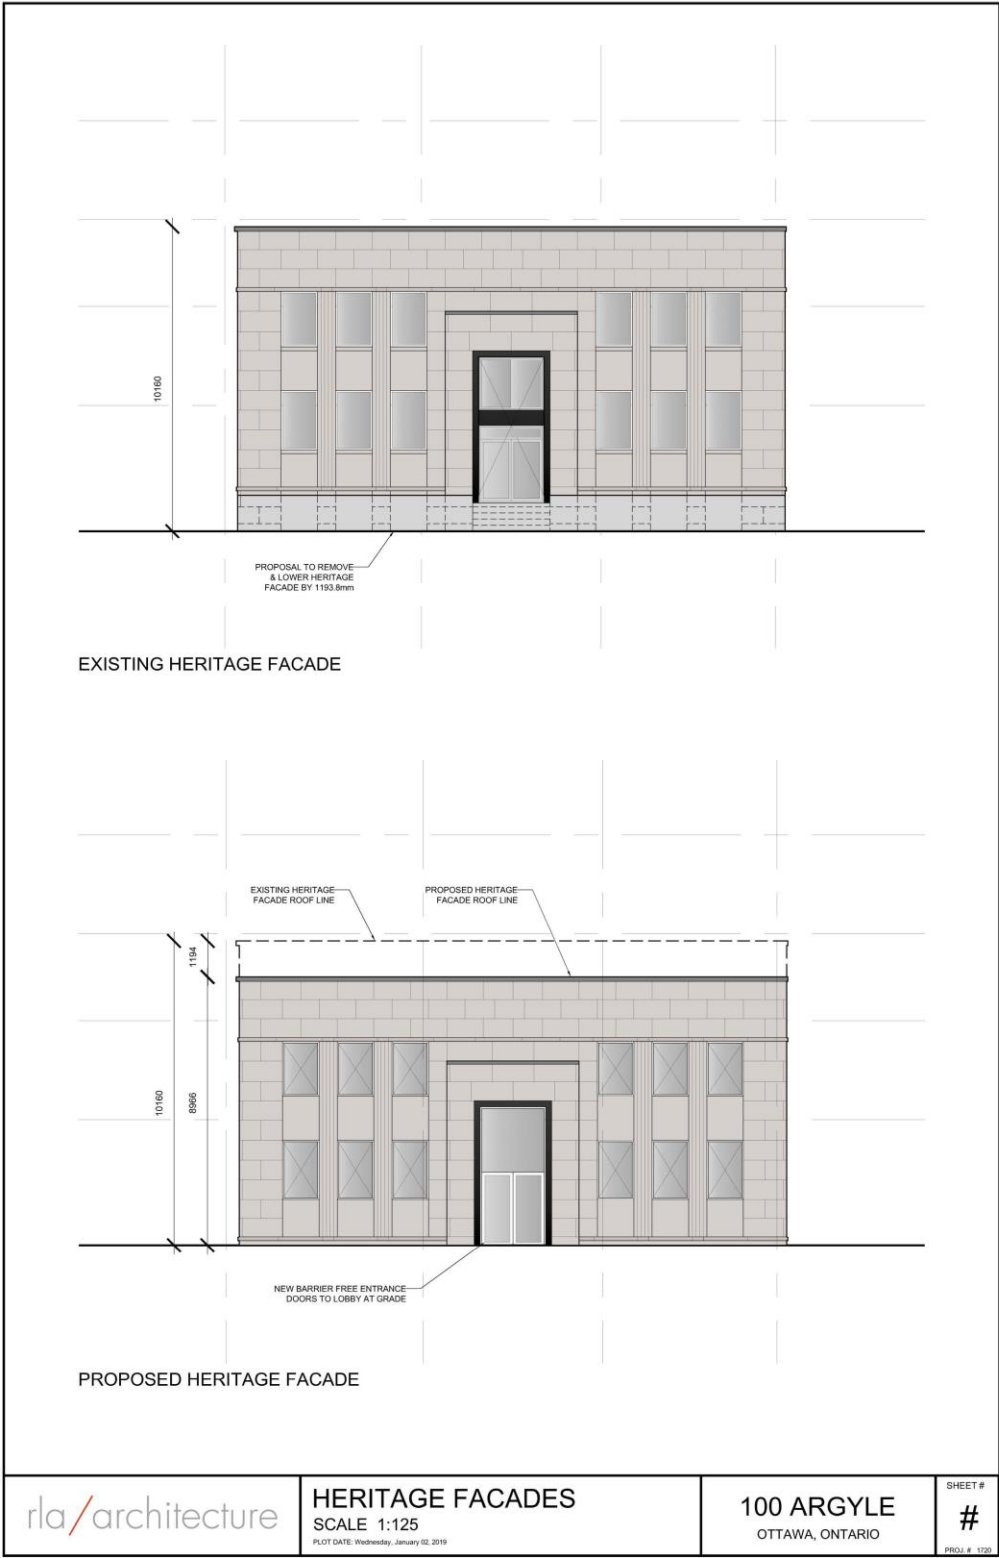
Elevation of existing building and the proposed modifications to the building. RLA/Architecture
